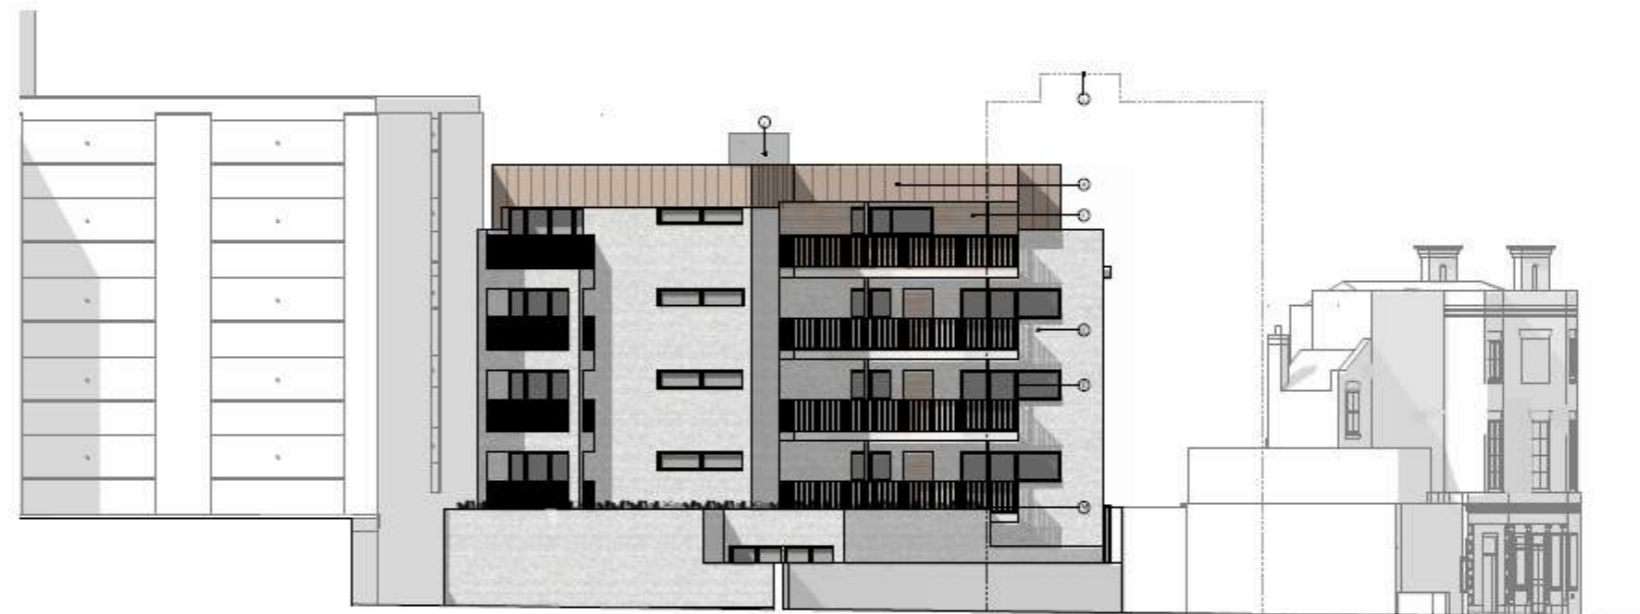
View looking northwest towards Site's development proposals on Malden Road (Source: John Pardey Architects, December 2015).
